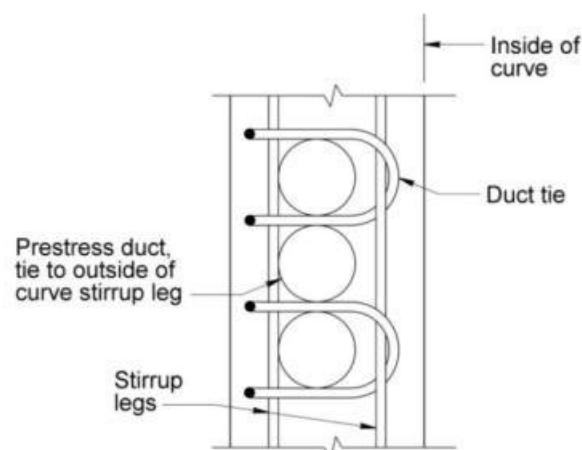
1—Generic Duct Tie Detail
